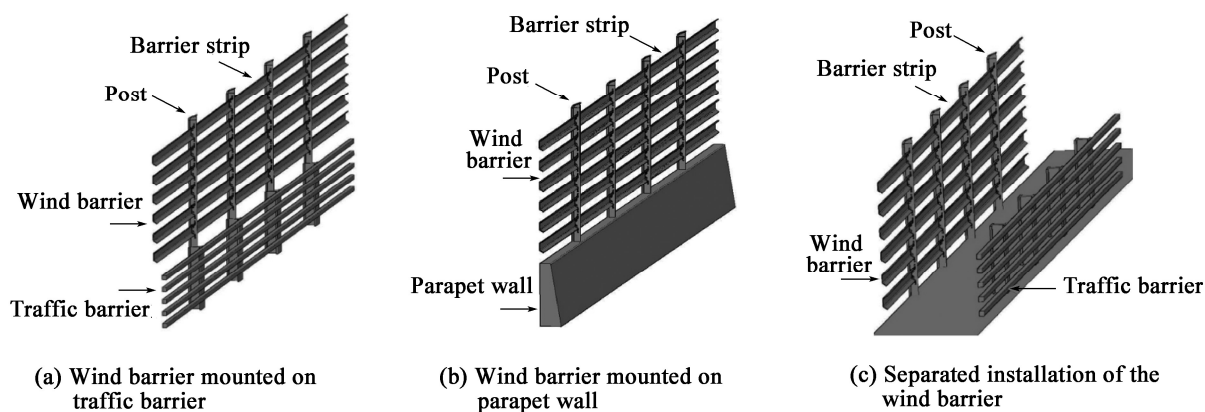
Composition of wind barrier and its connection to the bridge deck
